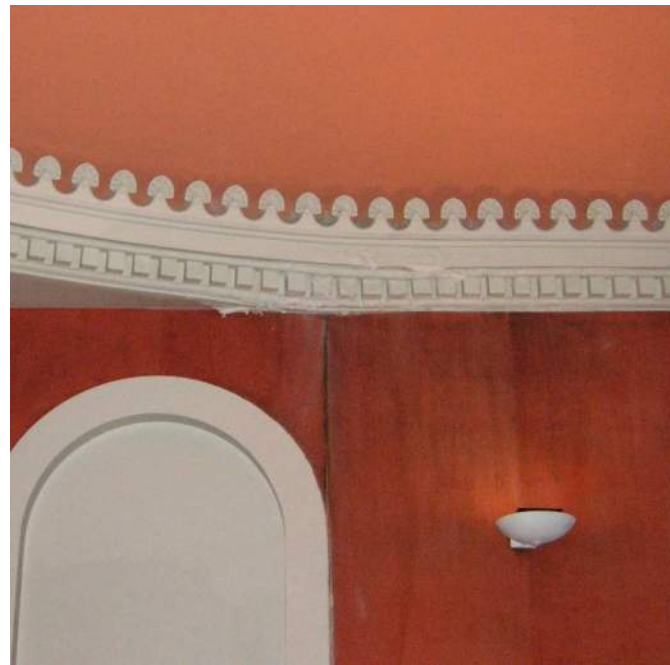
Interior Plaster Damage corresponding to downspout, valley, scupper roof area "B" North
